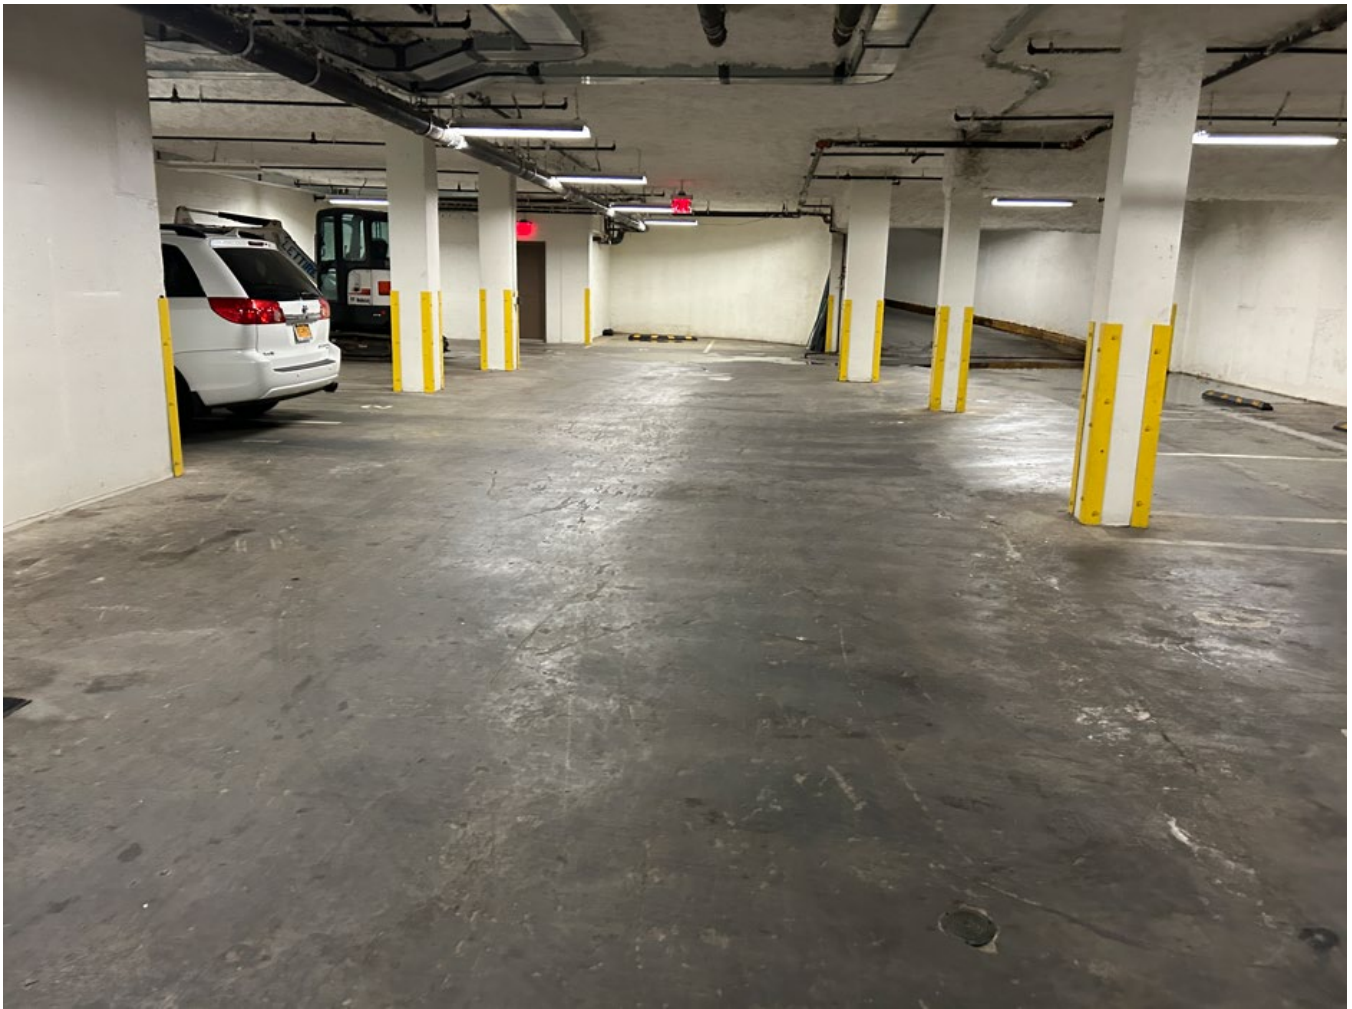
View of the sub-grade parking garage ramp and sidewalls, facing northeast. Note: The ramp is part of the composite cover system in the Track 4 Remedial Area.
